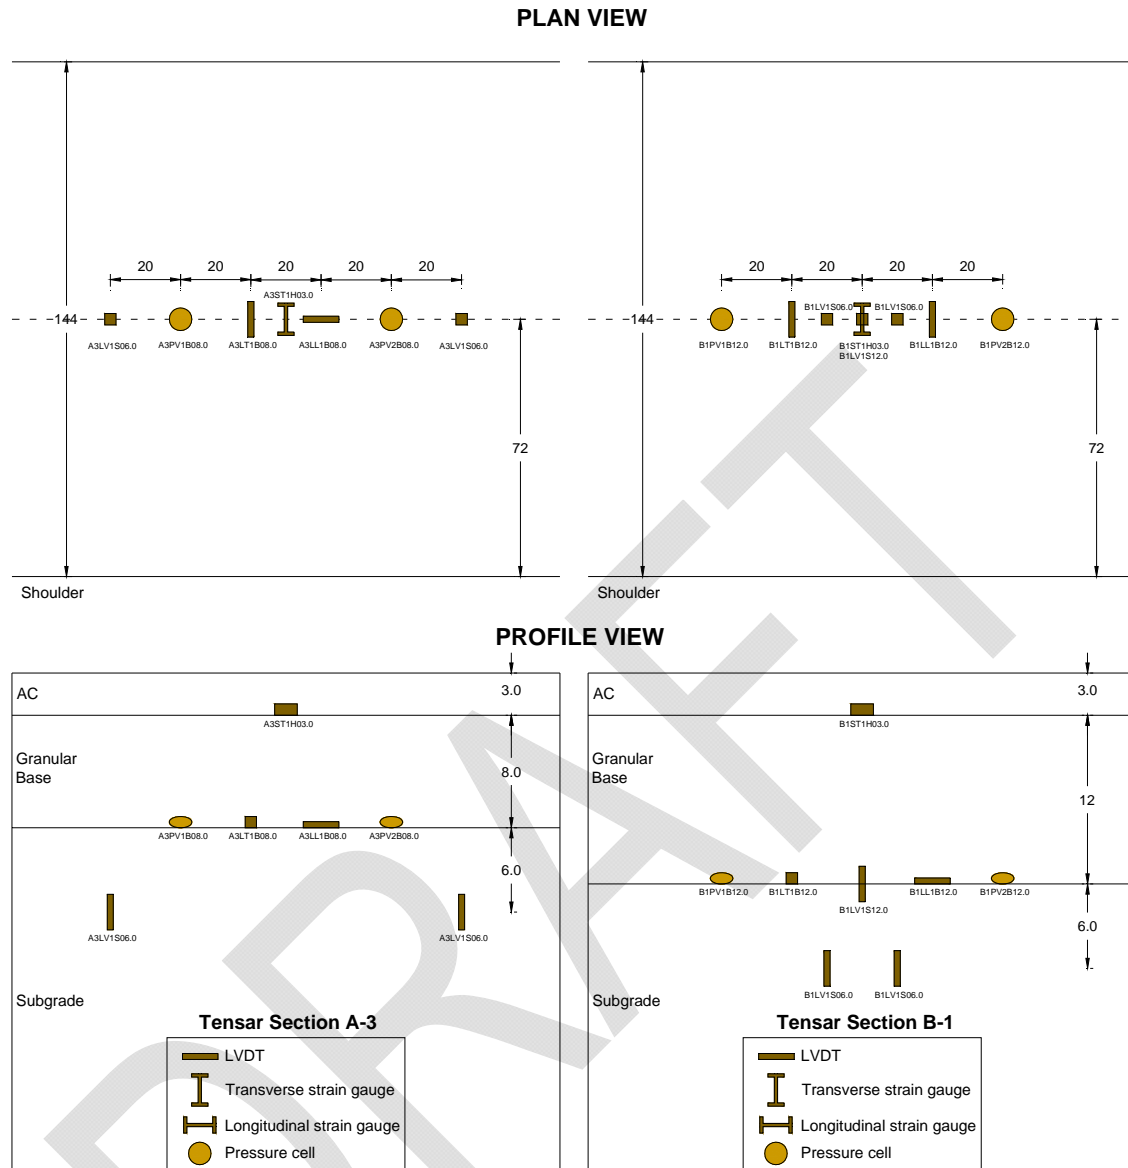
Plan and profile view of pavement structure and instrumentation of thin Section A-3 and B-1 at ATREL-UIUC
